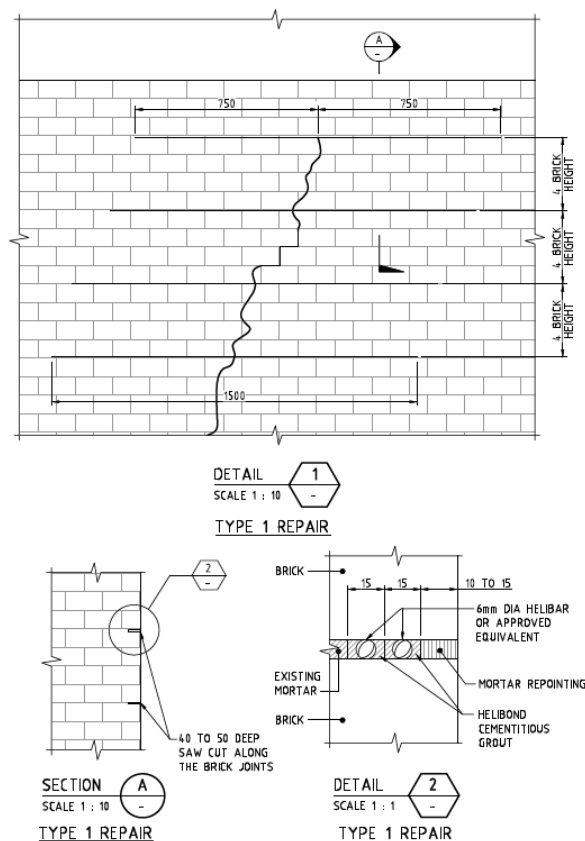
Areas of brickwork requiring crack-stitching (SMEC).
